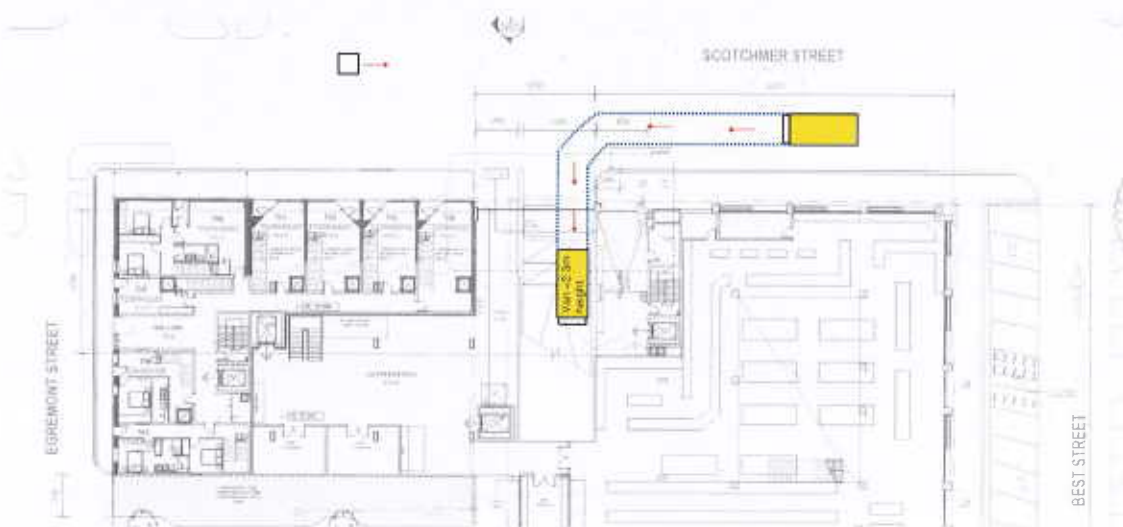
Entry to Basement Loading Dock from Scotchmer Street - Ingress
